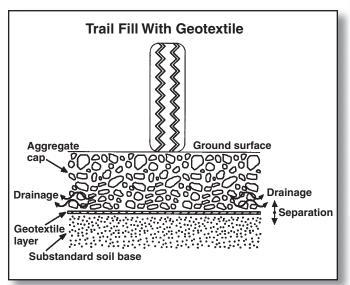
Trail fill material with geotextile. The geotextile layer enhances the trail performance by providing separation, reinforcement, and drainage.
